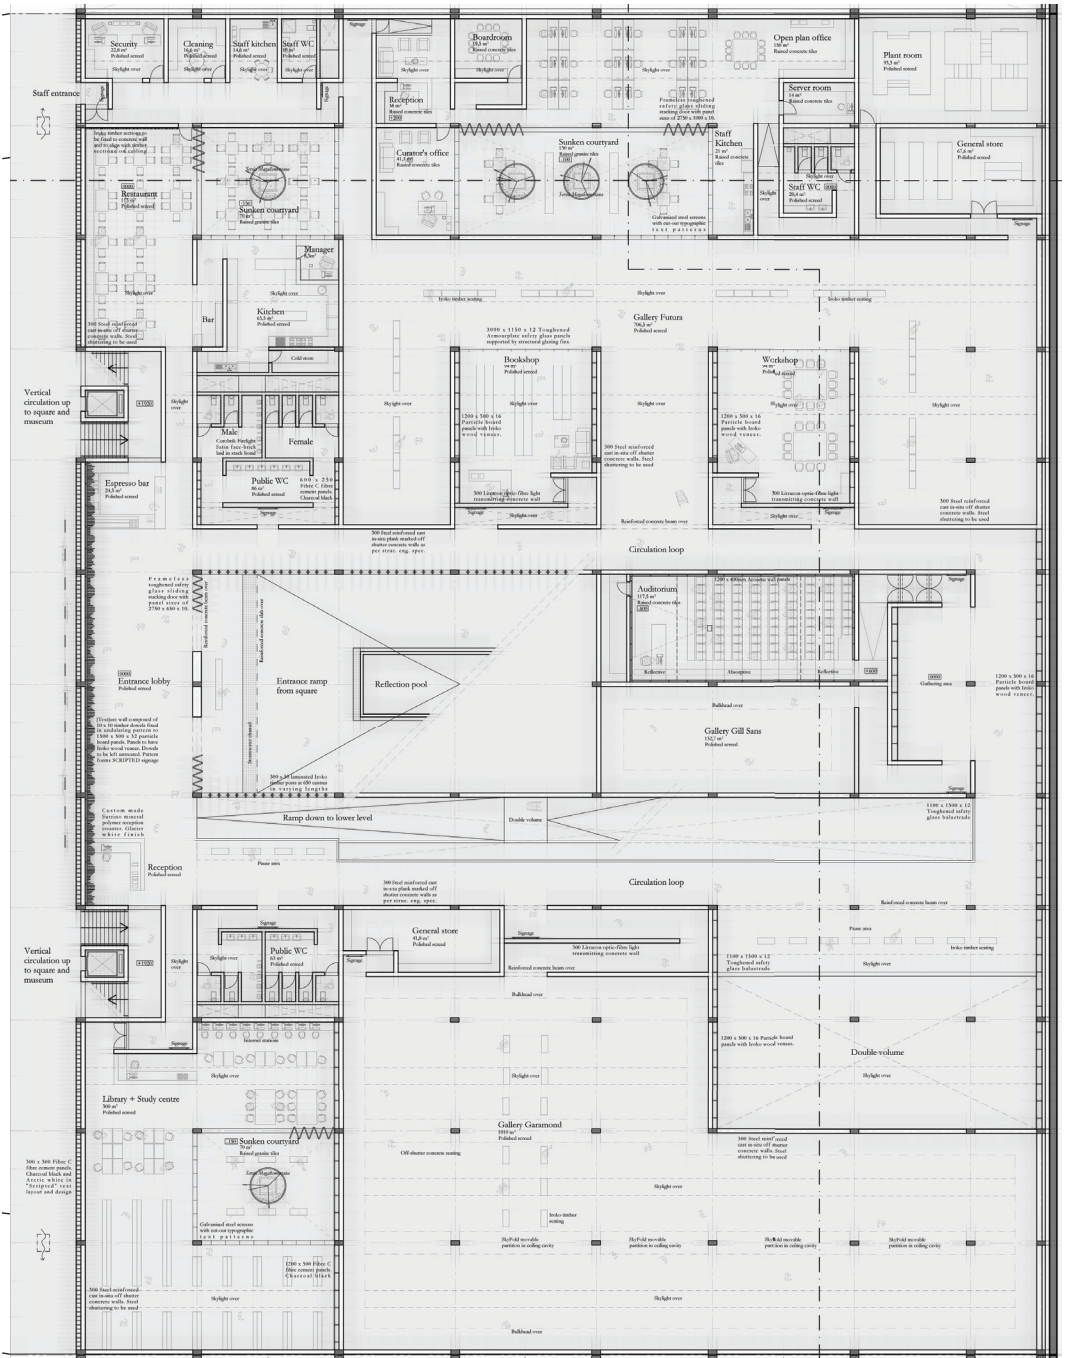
Callout of museum plan - first subterranean floor. Not to scale (Author, 2011).
